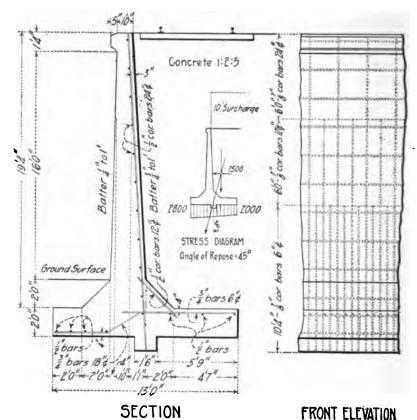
i. SLAB WALL, ILLINOIS CENTRAL R. R.
